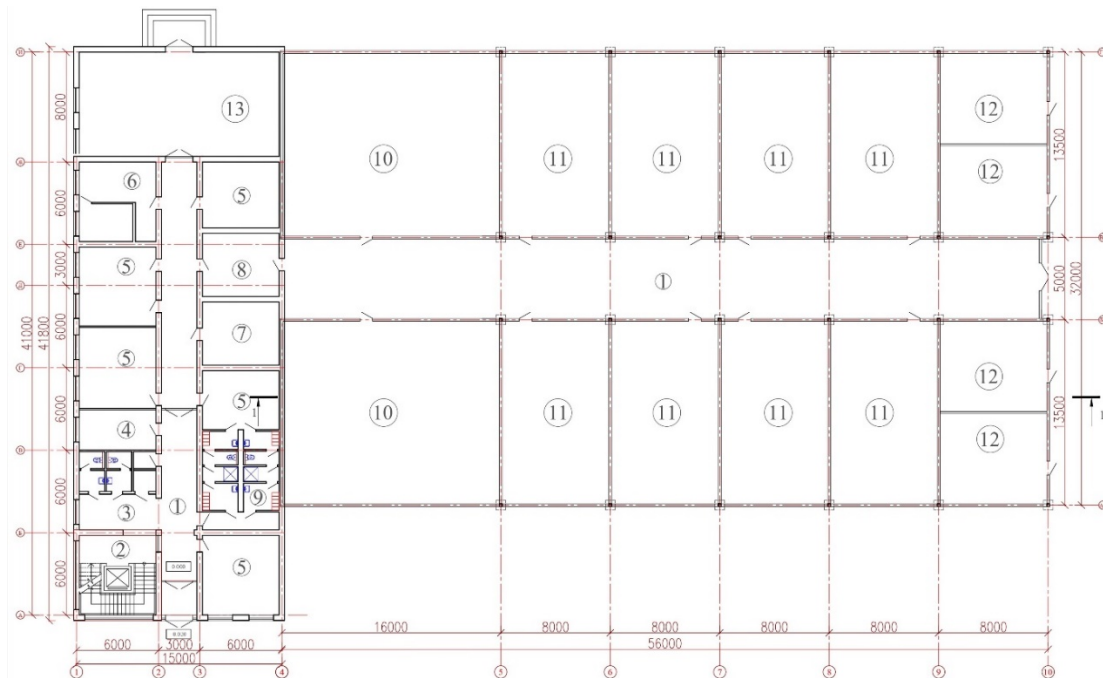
Plan of the first floor of the phytotron-greenhouse complex:
